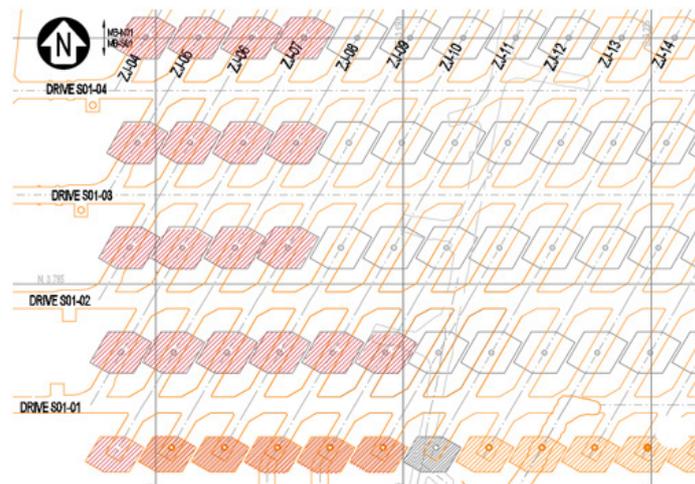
Plan view MB-S01, Chuquicamata Underground Mine
